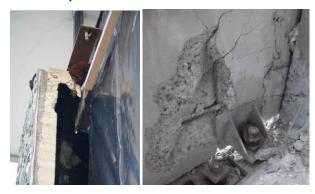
Connection of coffered precast panels that failed in June 13 aftershocks (left), precast panel and connection damage due to beam elongation (right).
